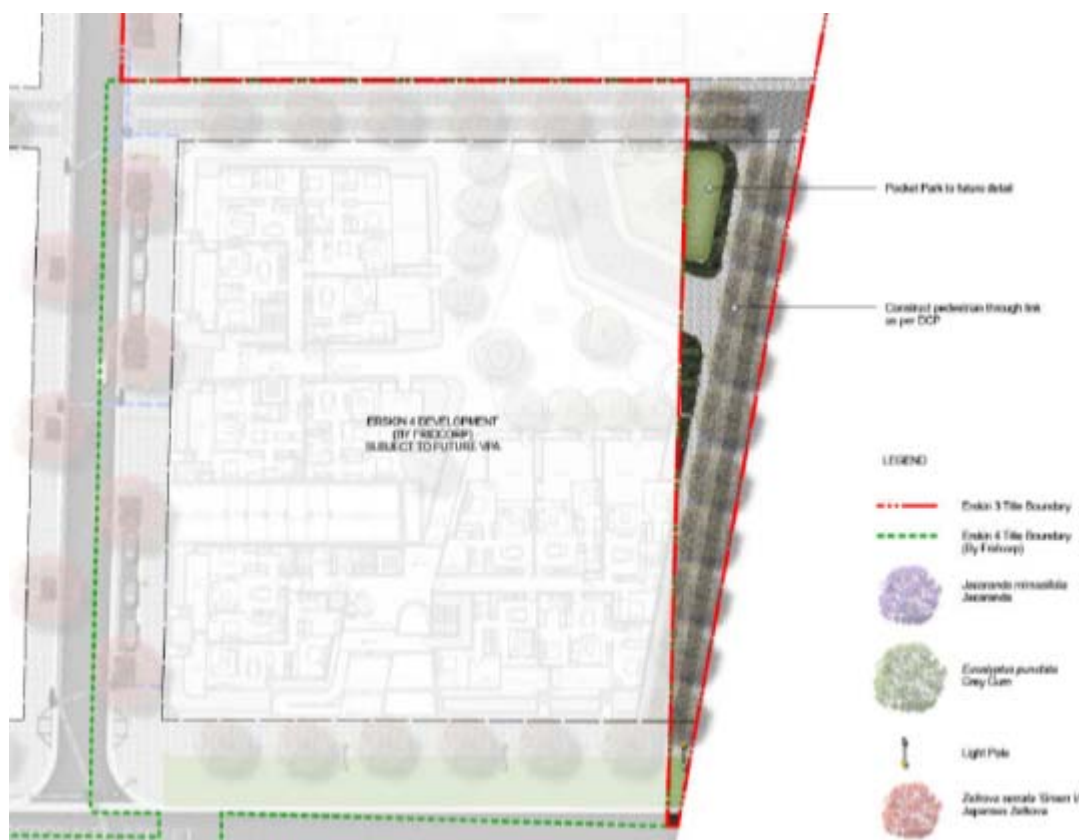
VPA Plans showing proposed 101m² triangular parcel of land in south-eastern corner to be dedicated as landscaping and through site link.
